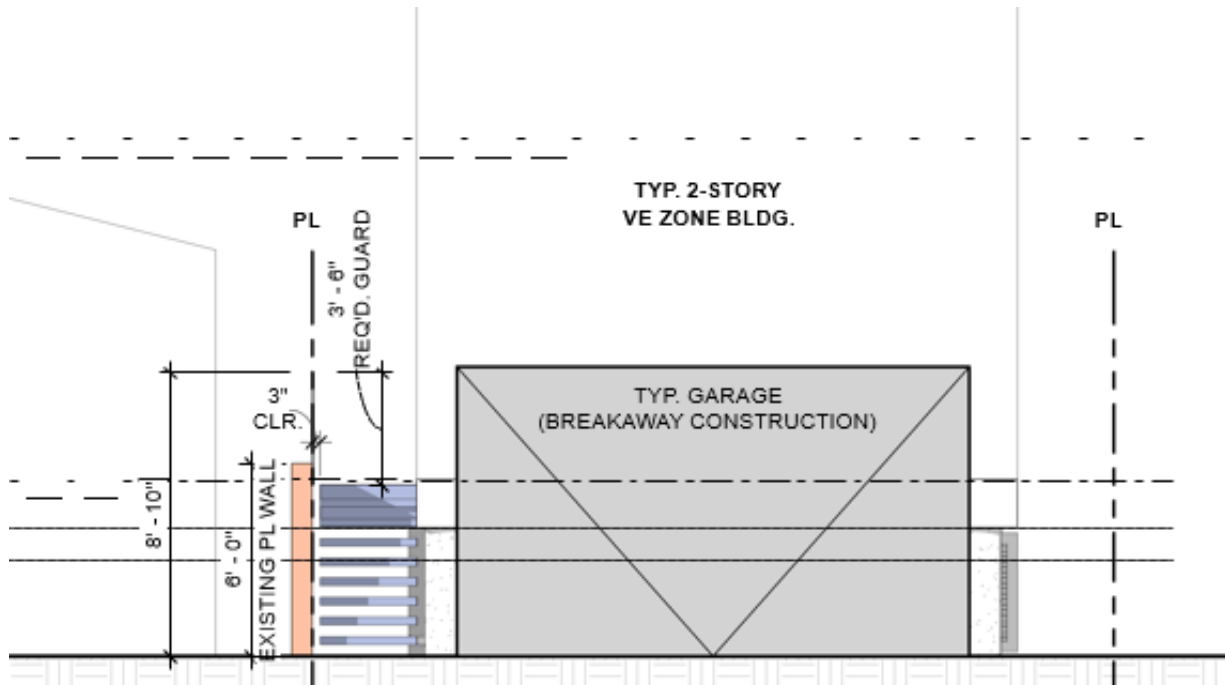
Rear Elevation of Side Yard with Proposed Amendments
